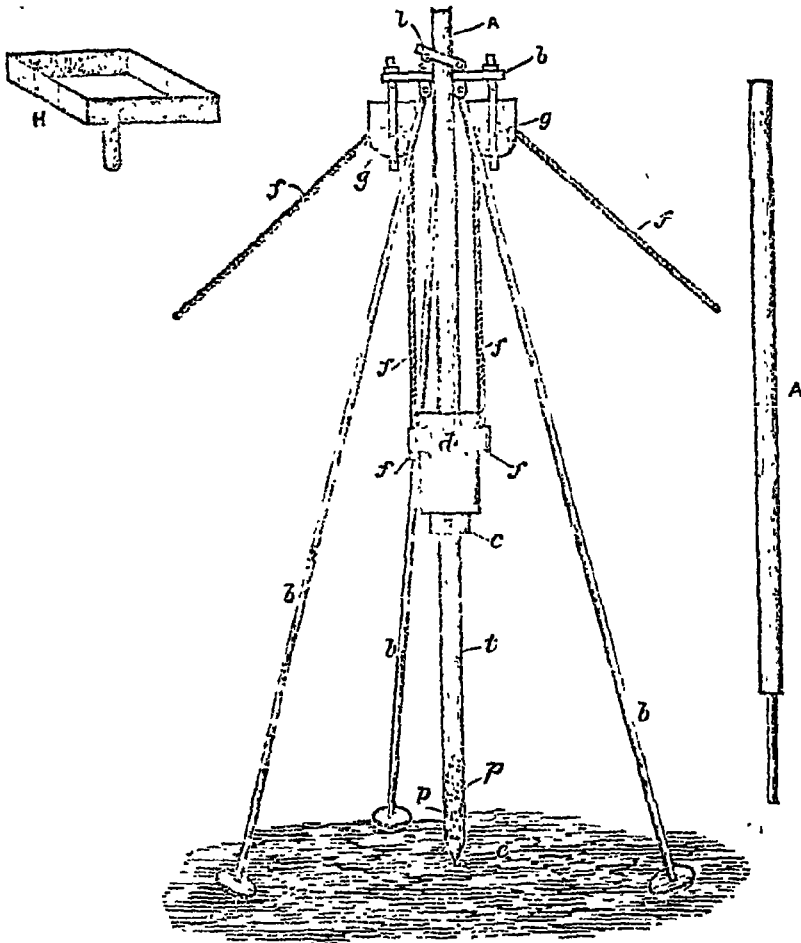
is a sketch to show Le Grand and Sutcliffe's apparatus for sinking tube-wells; *t* is the pointed and drilled tube which forms the bottom of the tube-well when driven; *c* is the steel driving-cap which is firmly screwed into the tube *t*, and which receives the blows of the monkey *d*. The lengthening-bar *A* is shown separately, and also in position in the well-tube; *b, b, b, b* is the tripod which carries the pulleys *g, g*, shown dotted (as they are not visible), over which the ropes *f, f, f, f* used in lifting the monkey pass; *l* is the latch of the tripod which keeps the lengthening tube in position; *H* is the funnel placed in the well-tube when sand, etc., have to be extracted from the well; *c* is the solid driving point of the tube-well, and *p, p* the perforations in the tube through which the water passes into the well.
